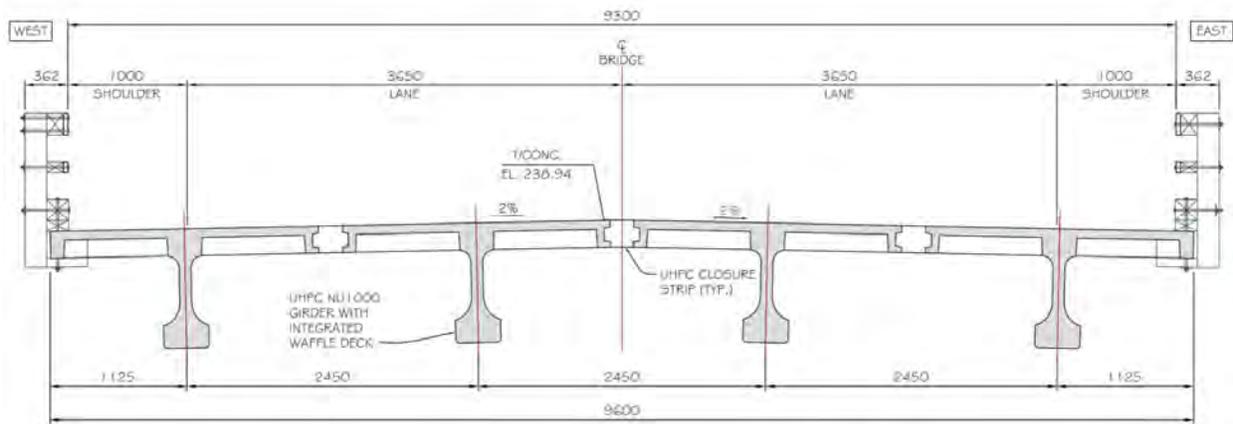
Proposed UHPC DIB Bridge Precast Modules with UHPC Closure Joints
